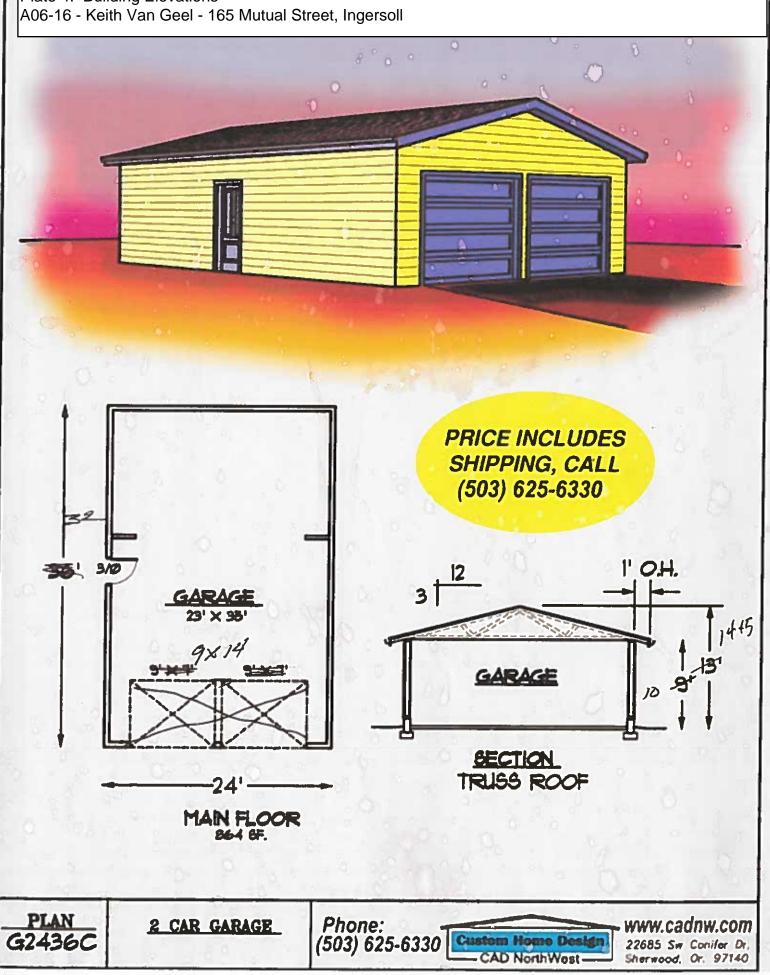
Building Elevations A06-16 - Keith Van Geel - 165 Mutual Street, Ingersoll
